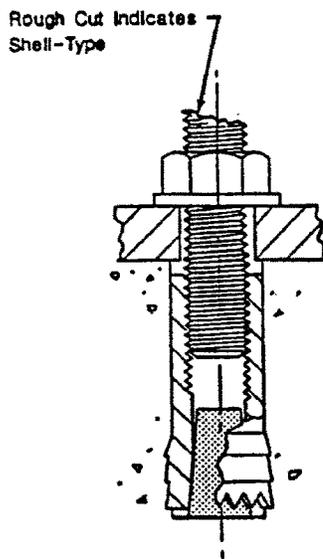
c and C.2-3.d show other types of shell-type expansion anchors in which the visible portion is characterized by a rough cut or a raised knob on the end of the threaded rod. Careful inspection is necessary to distinguish these two types of shell expansion anchors from the nonshell-type shown in Figure C.2-3.a.
